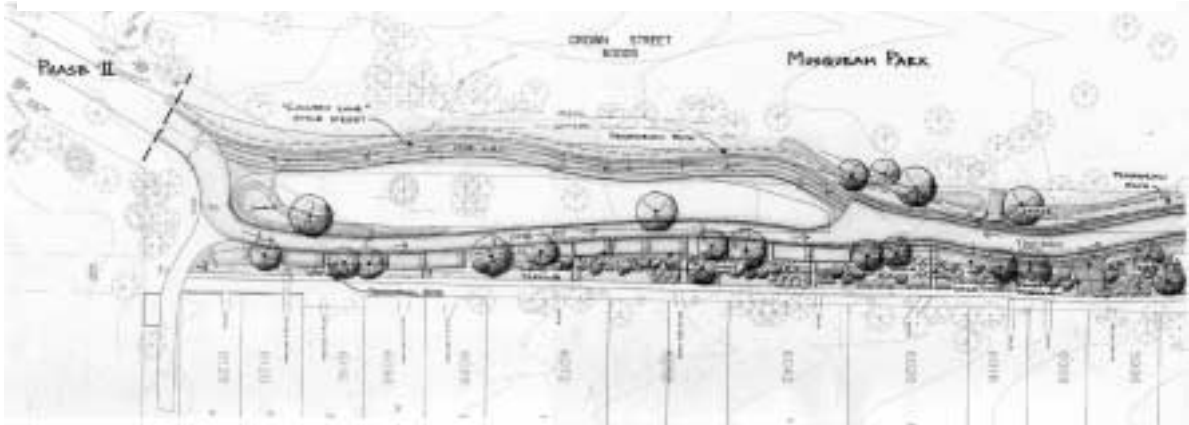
Plan of the *Naturalized Streetscapes* design, north end of Crown Street.
